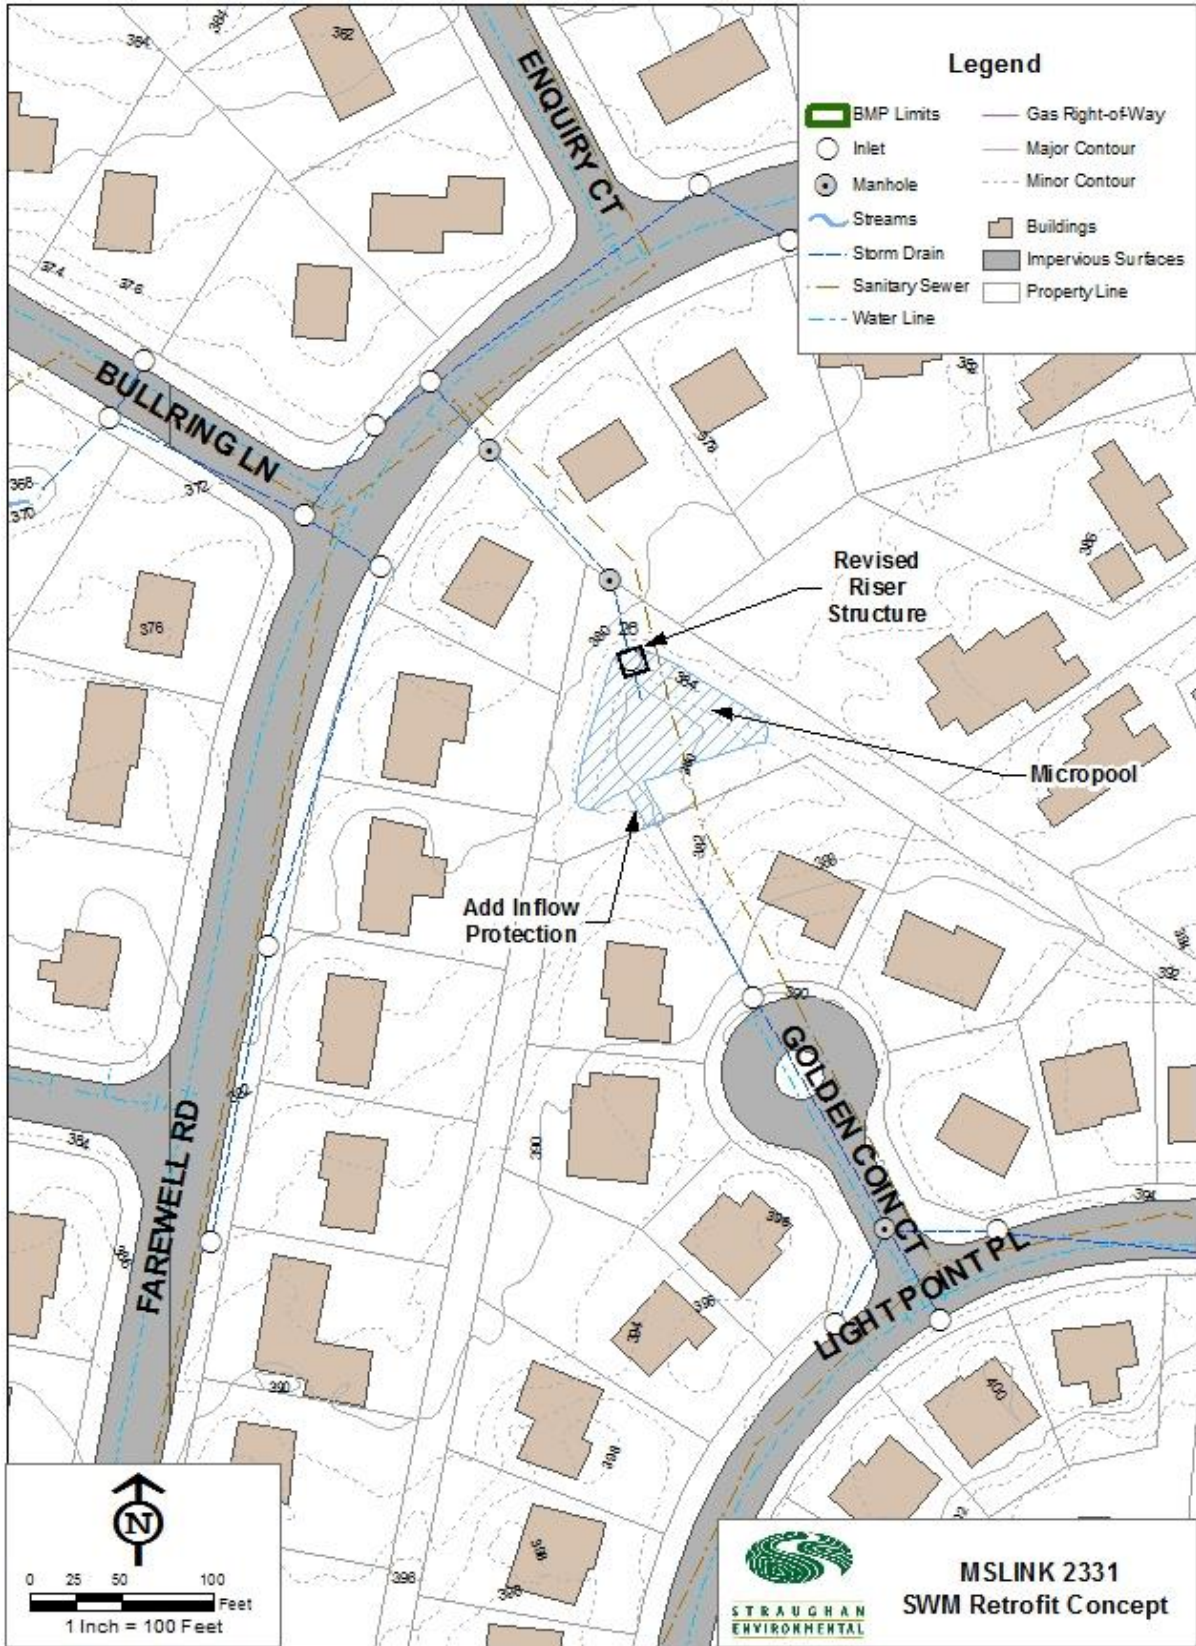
Concept Design Plan View at 6527 Golden Coin Court, SLP-BC-D798
